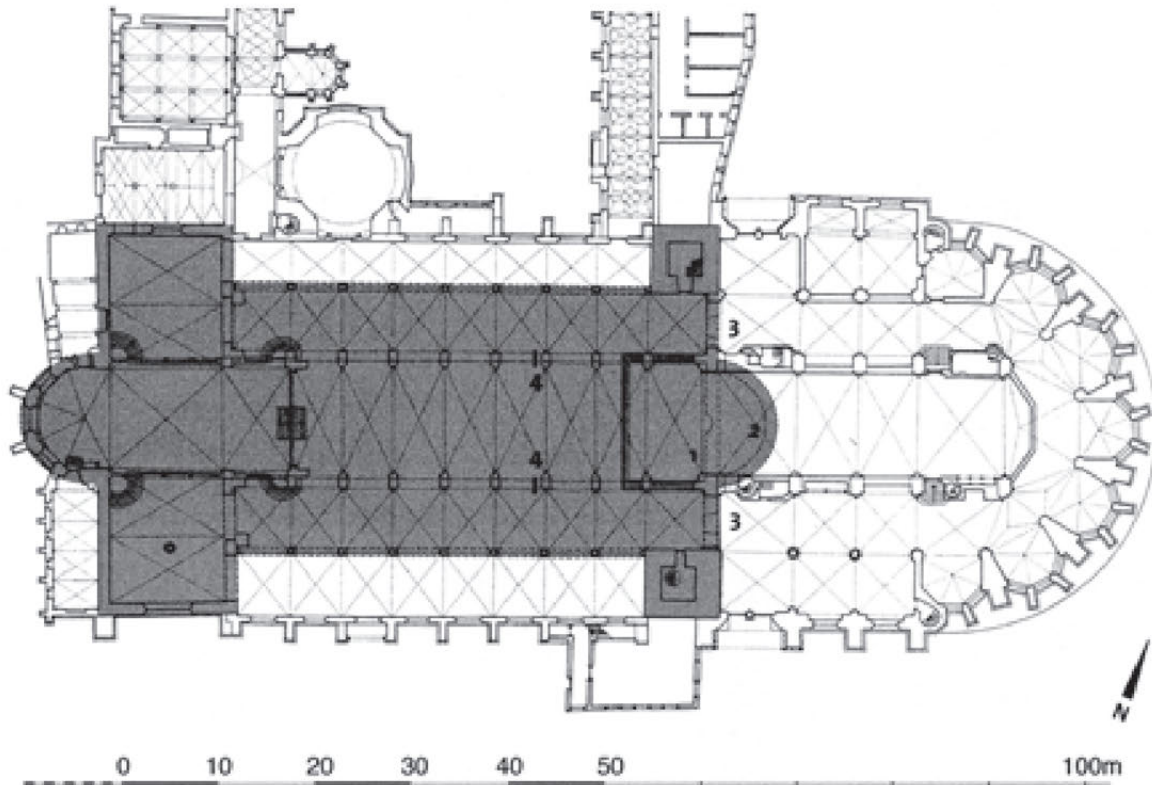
Augsburg Cathedral, ground plan, in grey: the Ottonian cathedral c. 1030 (reconstruction Hildegard SAHLER & Reinhold WINKLER)
